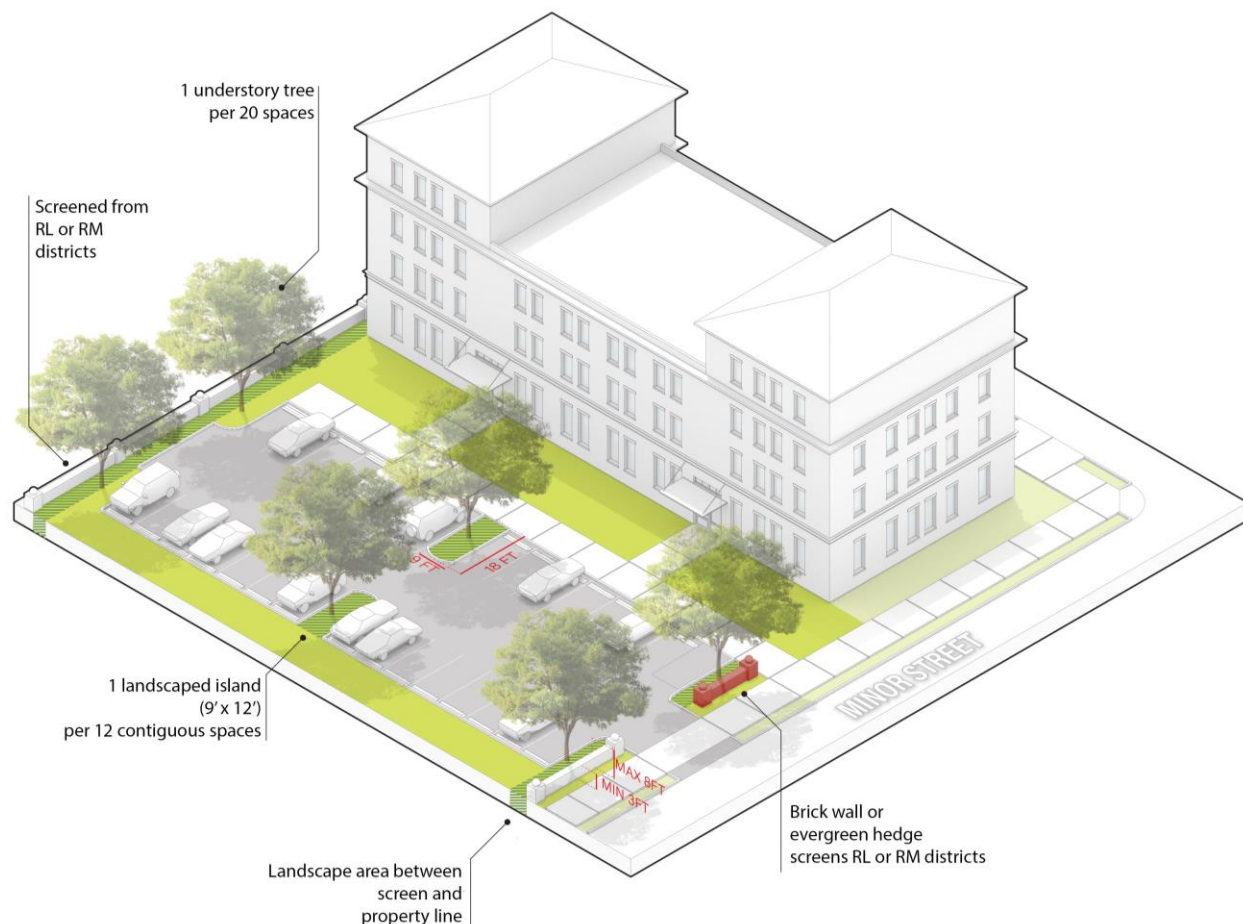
Summary of Parking Lot Landscaping Requirements
